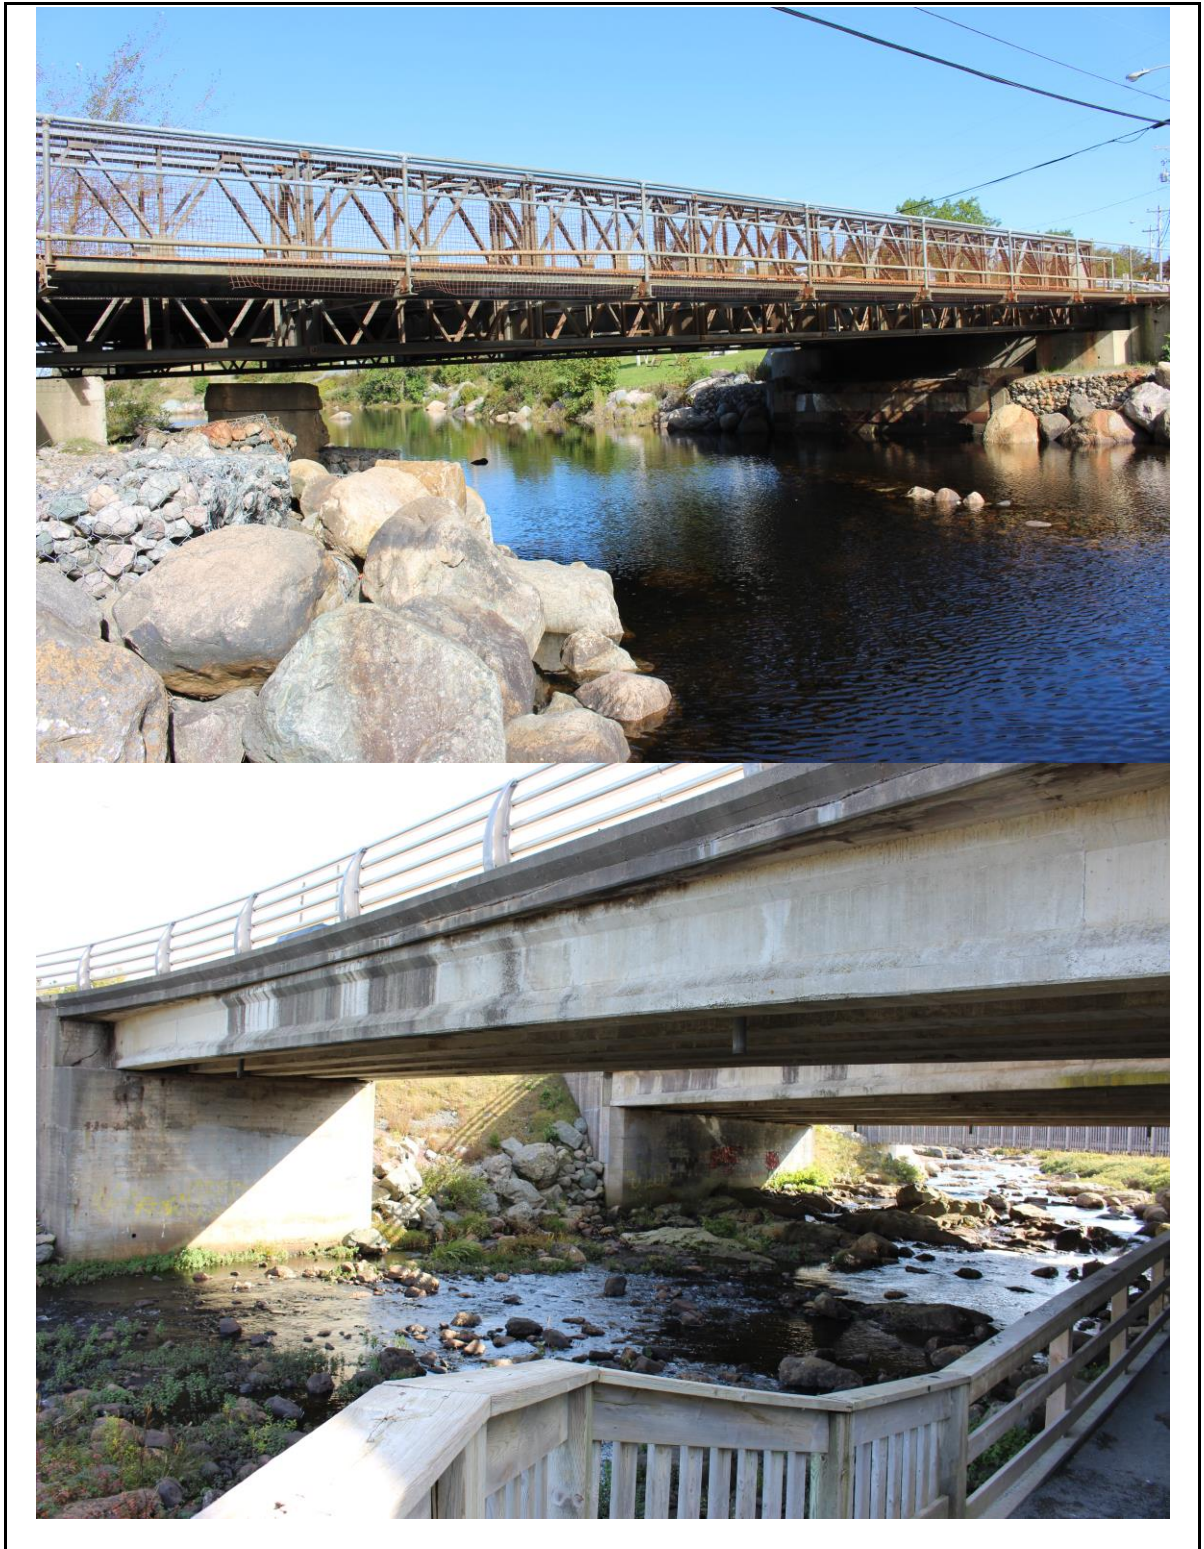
A steel span bridge (top) and a concrete span bridge (bottom)
